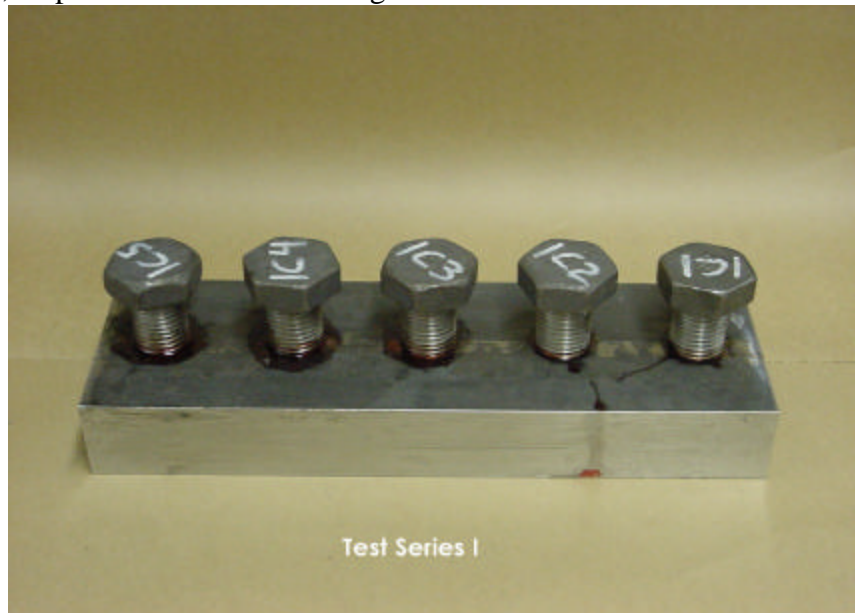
1-1/2"x 4" long A325 plain bolts in 2" deep tapped holes in a 2-1/2" thick steel plate, no pre-tension.
